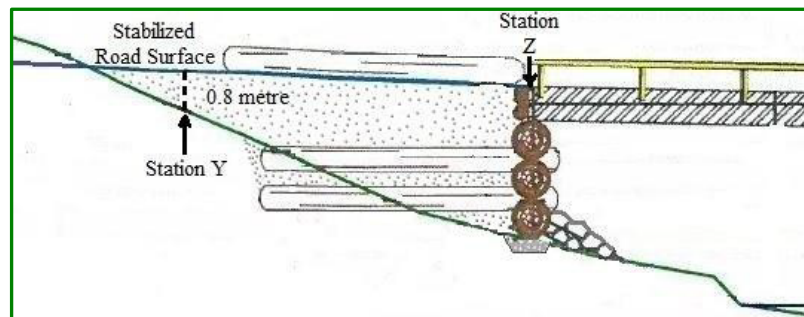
Bridge Approach Large Fill Build-up - Example Diagram
